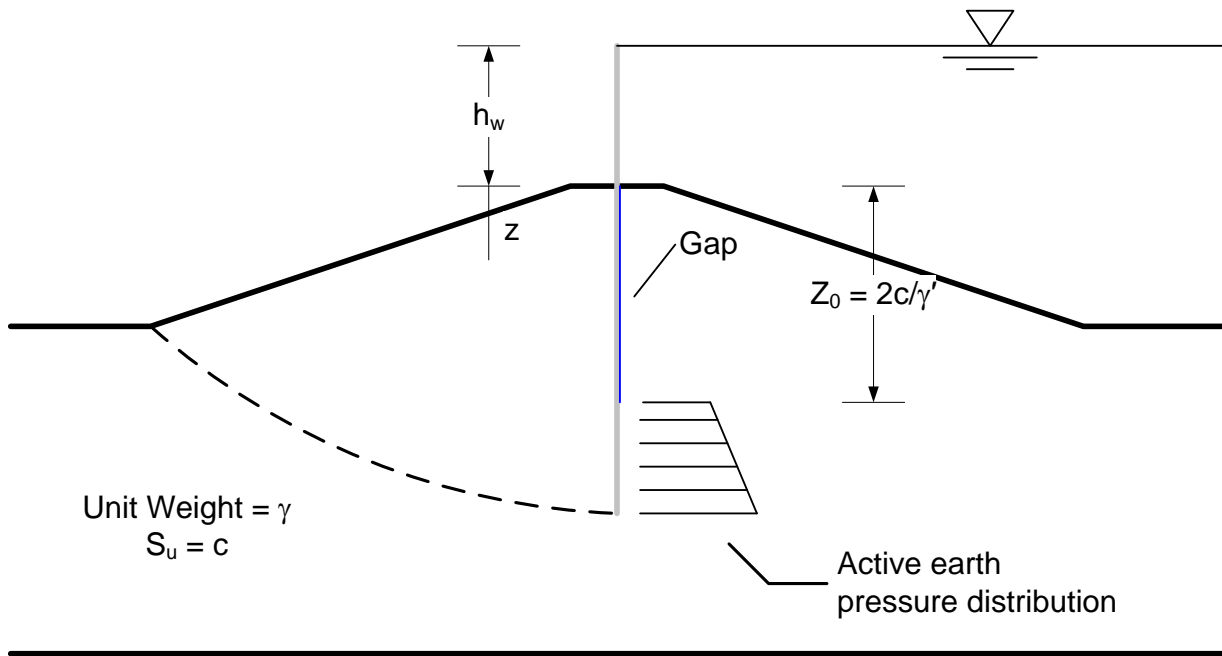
Gap formation for I-wall for uniform embankment and foundation soil properties
